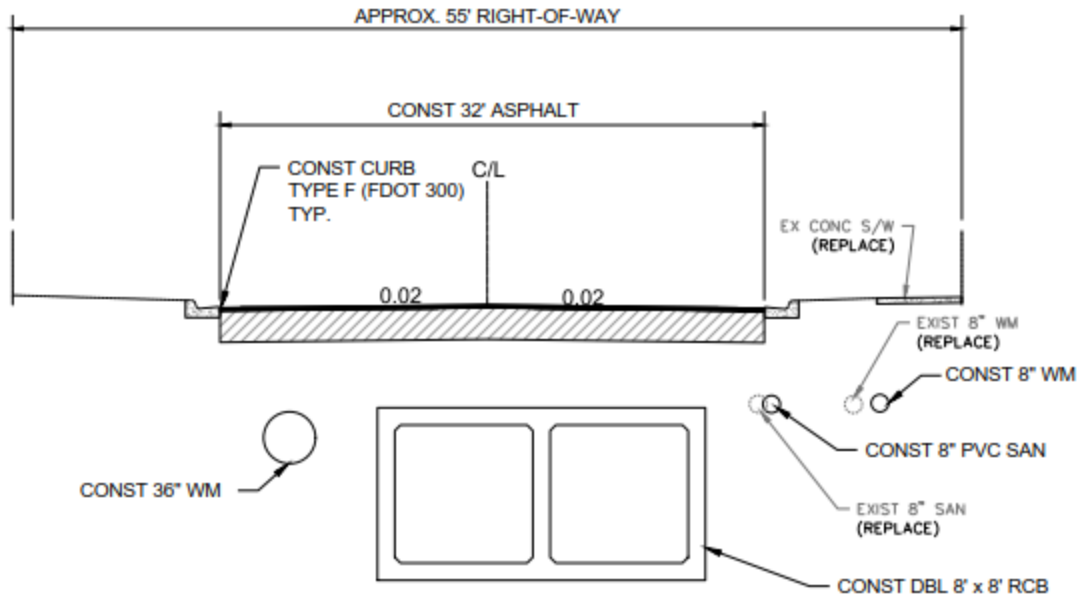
Rome Avenue north of Gray Street Typical Section (NTS)
